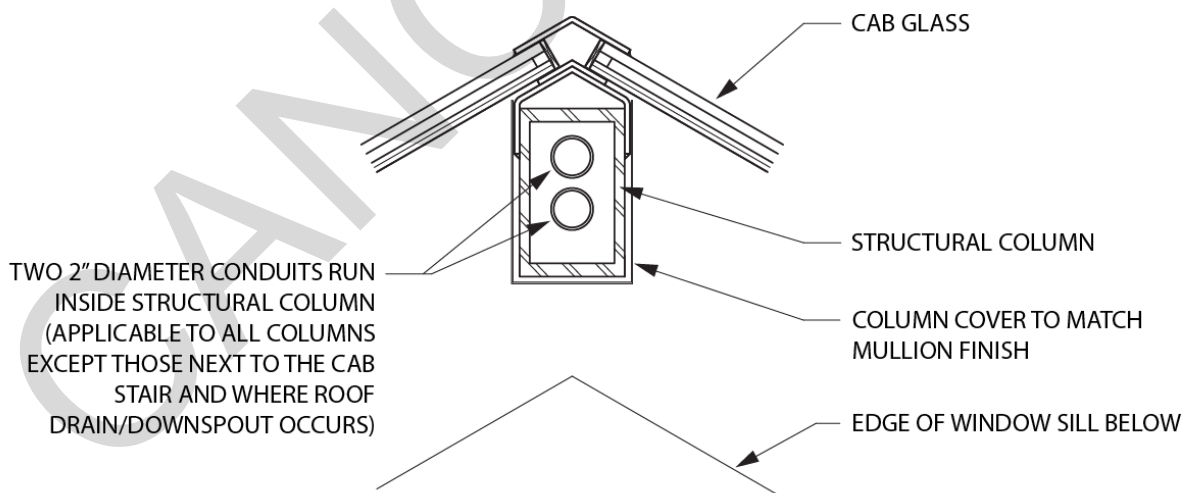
Plan Detail at Control Cab Window Mullion and Structural Column (Navy)
